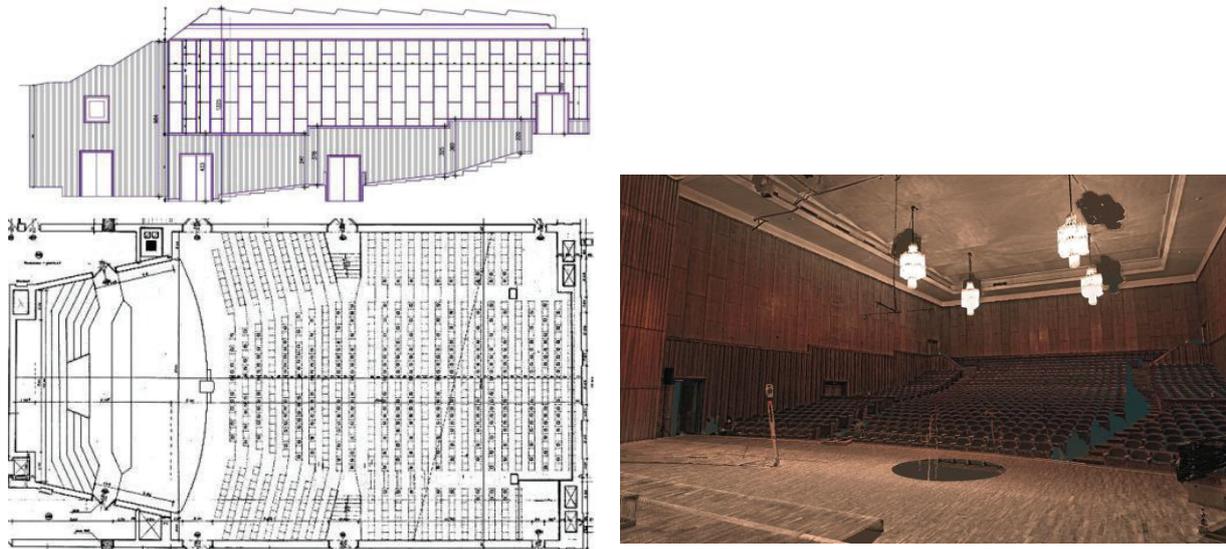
A cross-section, a floorplan, and a scan image of the Pomeranian Philharmonic concert hall
